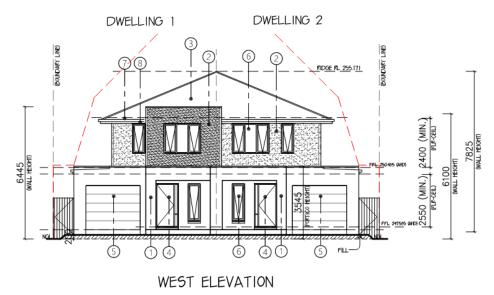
West elevation (streetscape) (Sheet 5 of 6)
